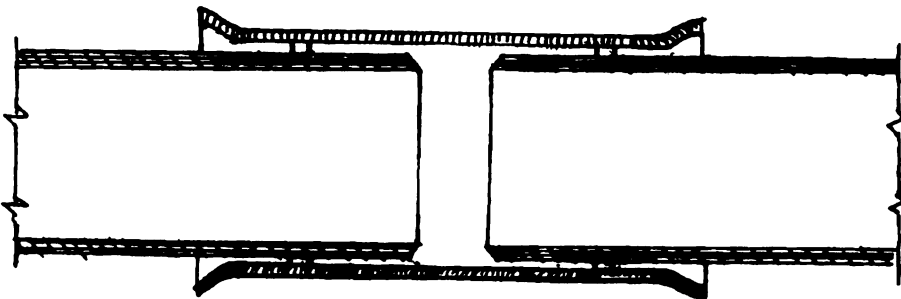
PVC repair coupler for PVC pipes with rubber rings or cemented by special cement.
